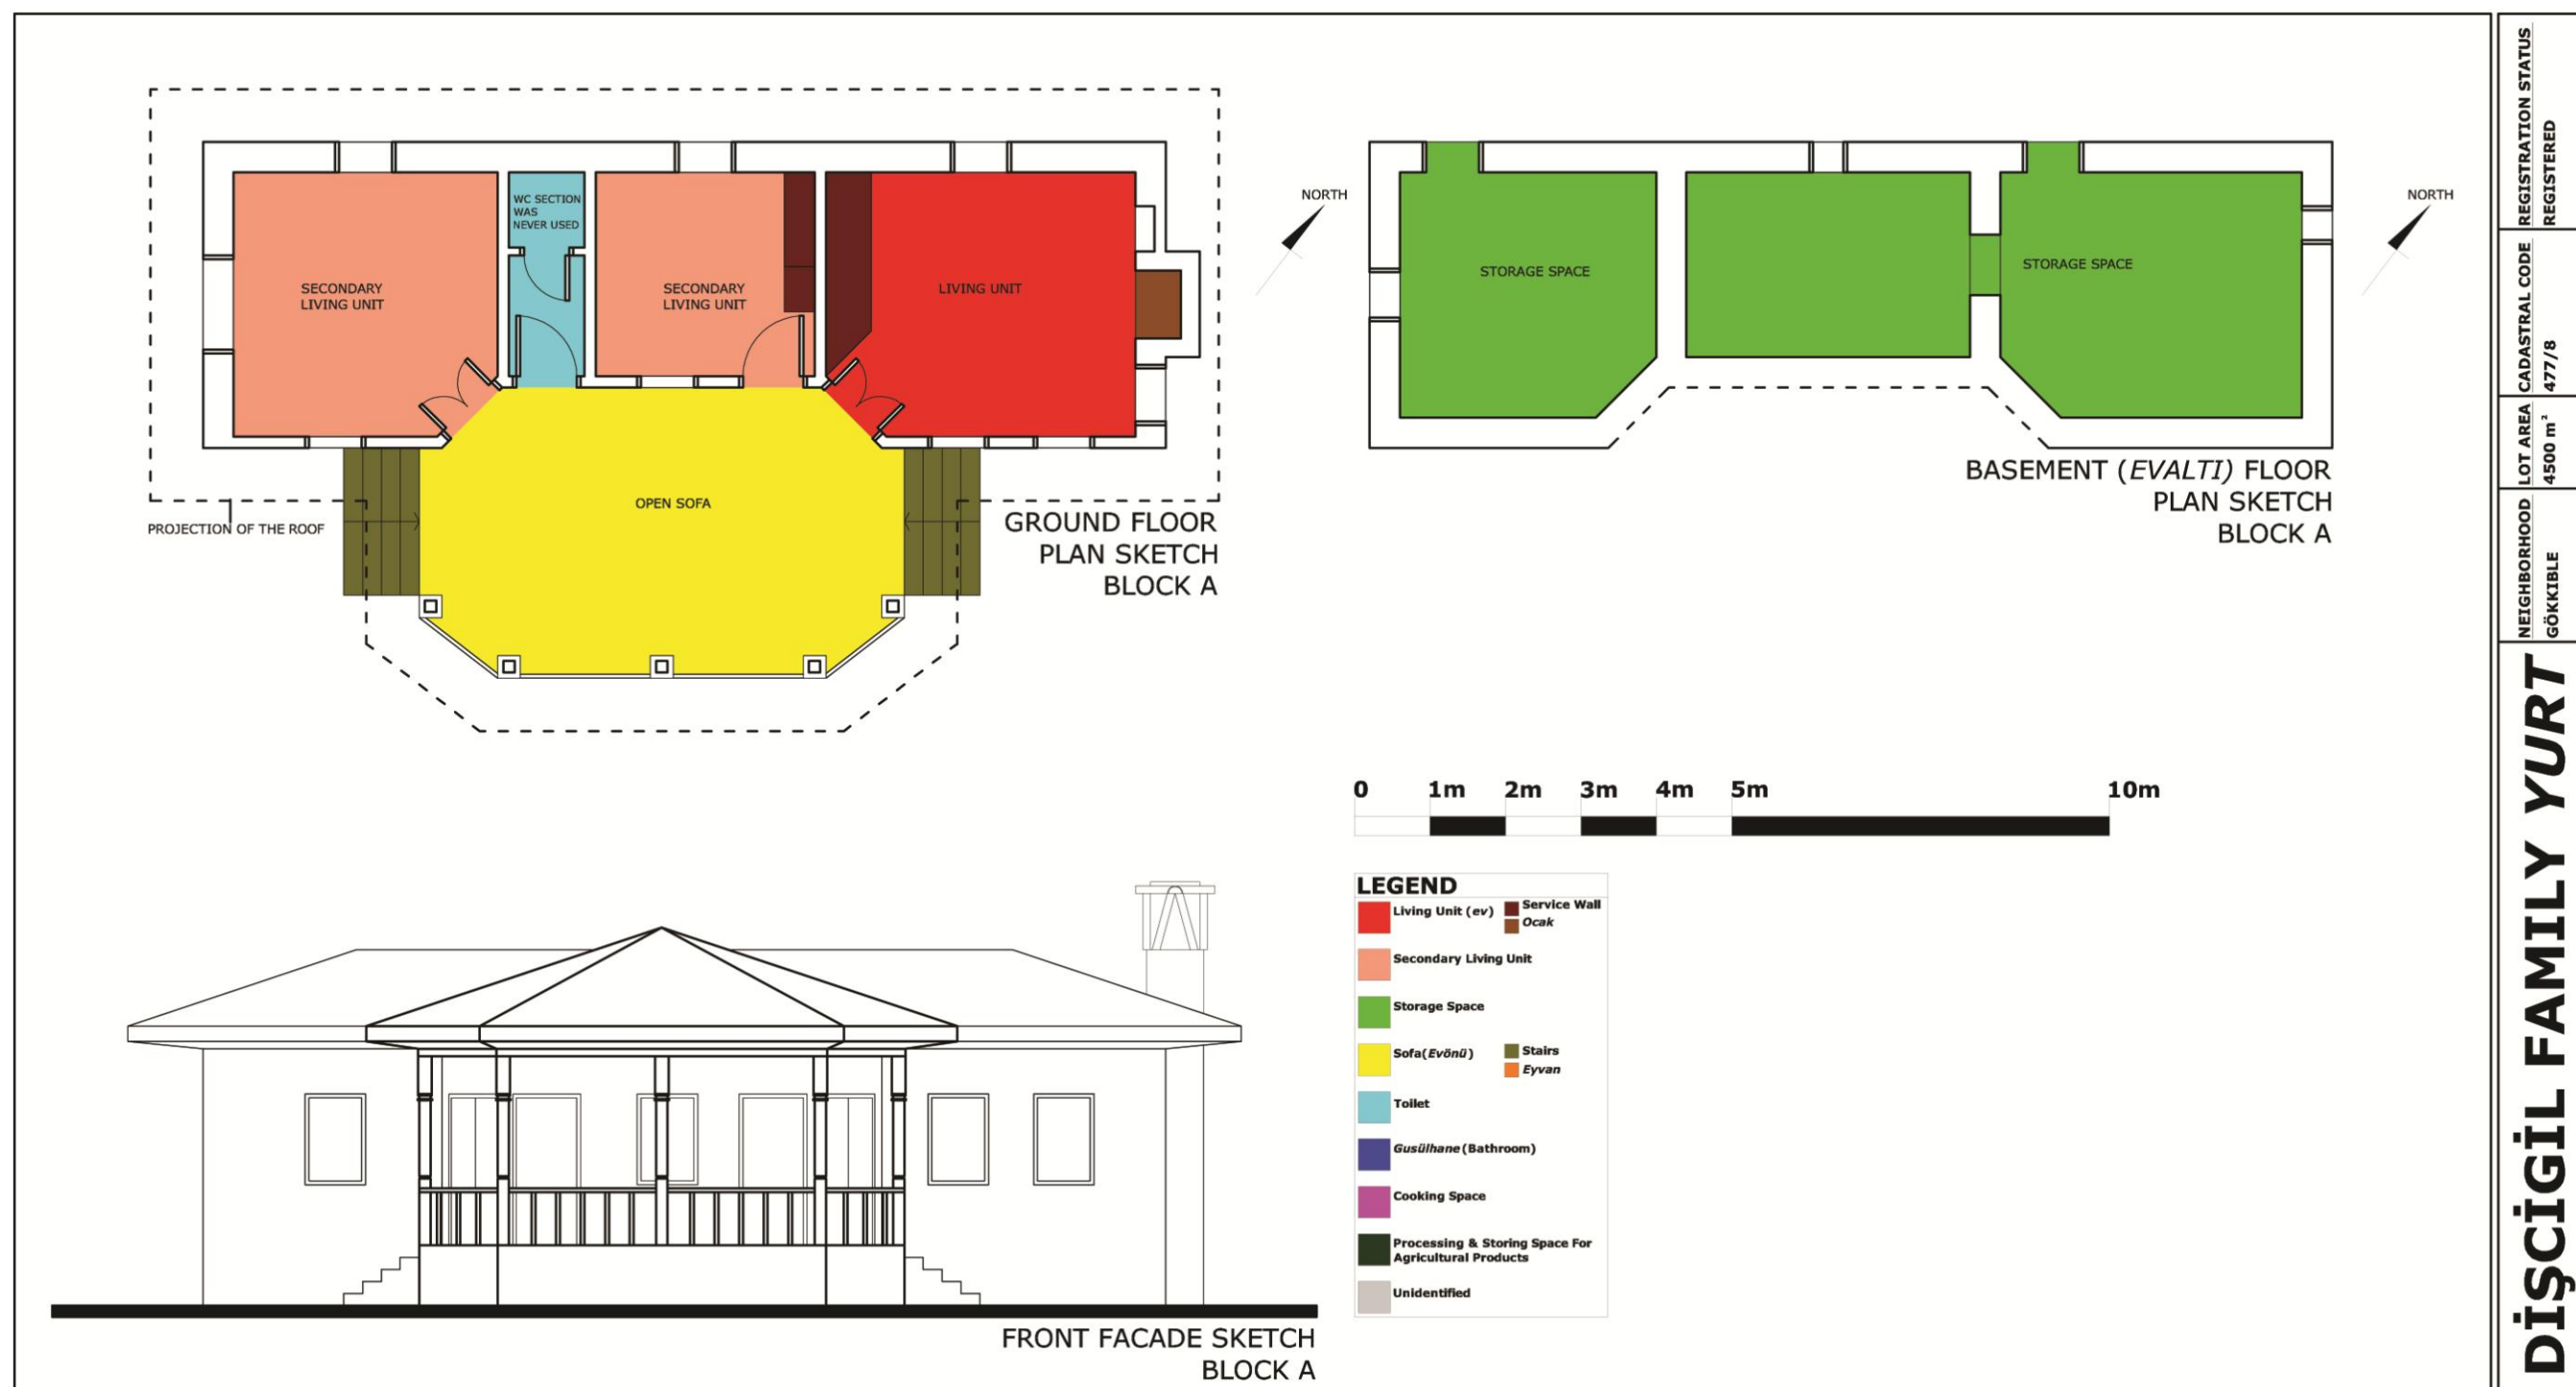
Plan and front façade sketches of Block A in the *yurt* of Dişçigil Family
